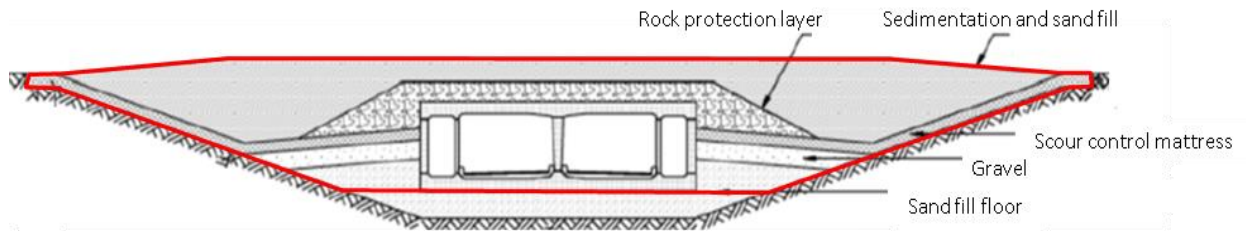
Schematic Cross-section of the Tunnel (not to scale). Red Polygon Indicates Assumed Extent of Excavation¹.
